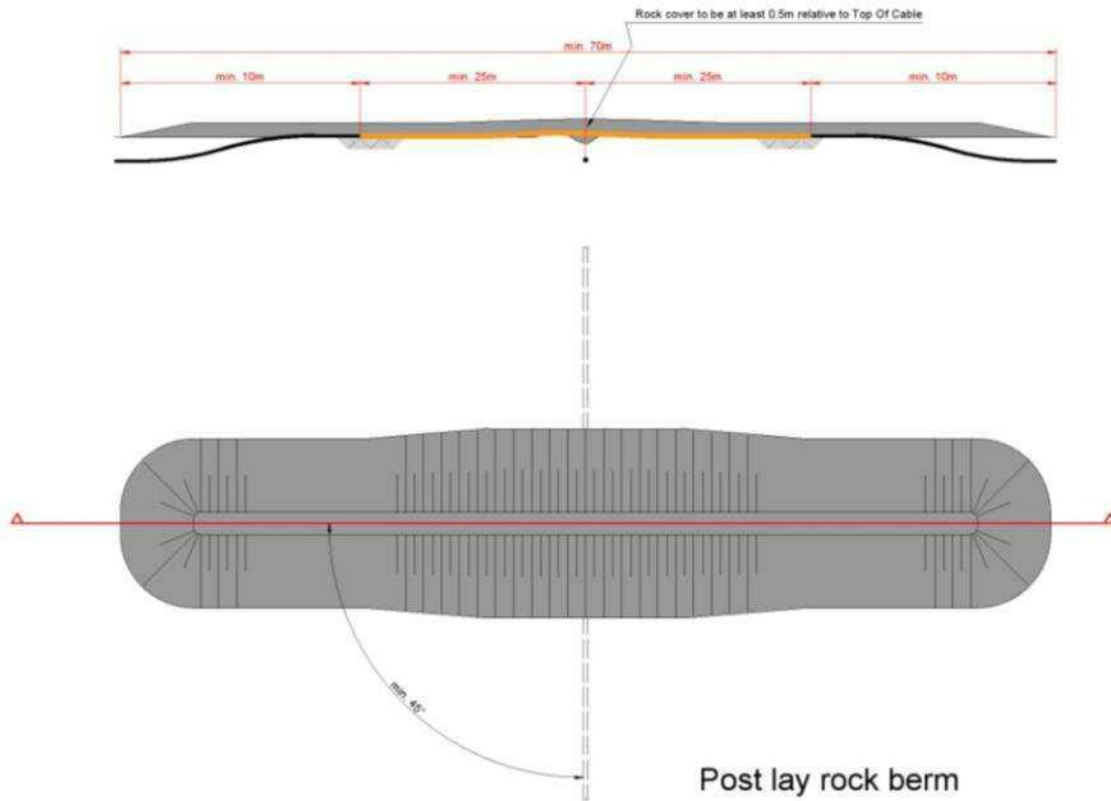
Typical lowering 3rd party asset - rock crossing structure
